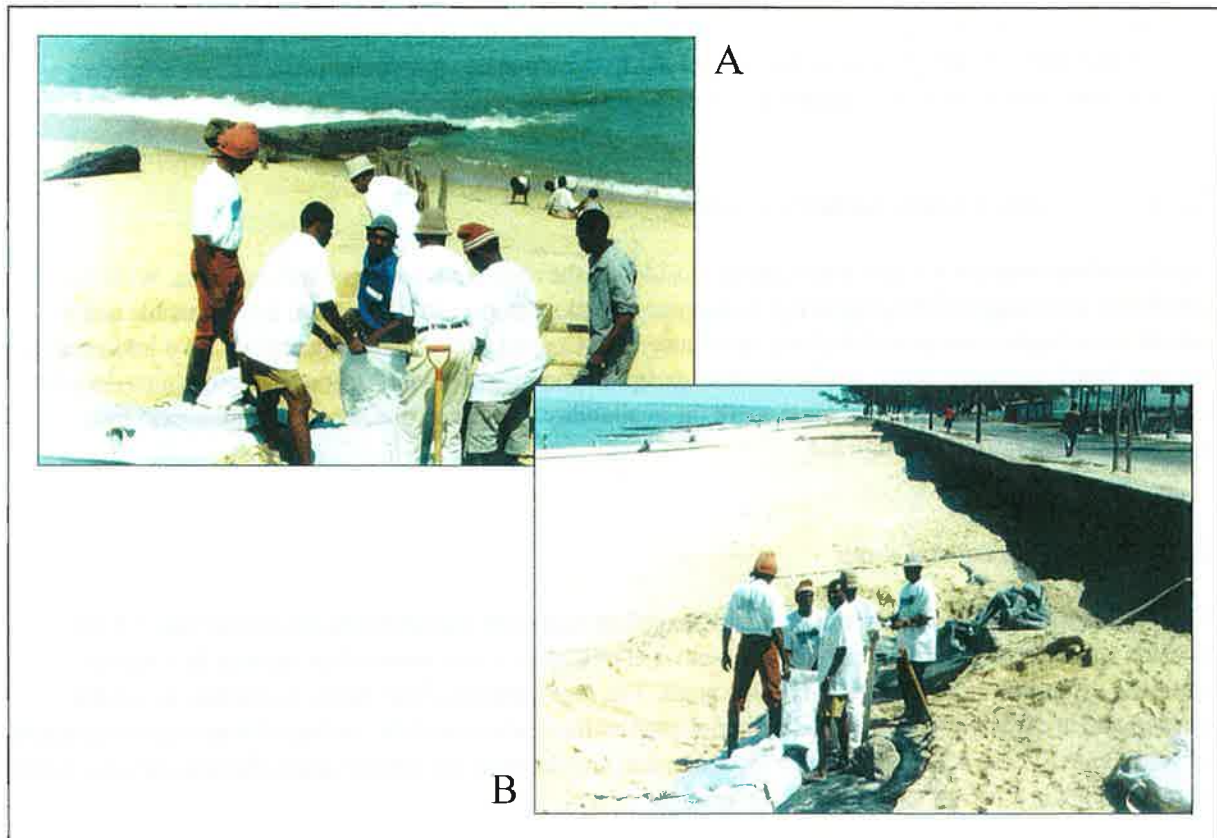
Repairs to corner between groin (A) and road (B) at Miramar seawall site
